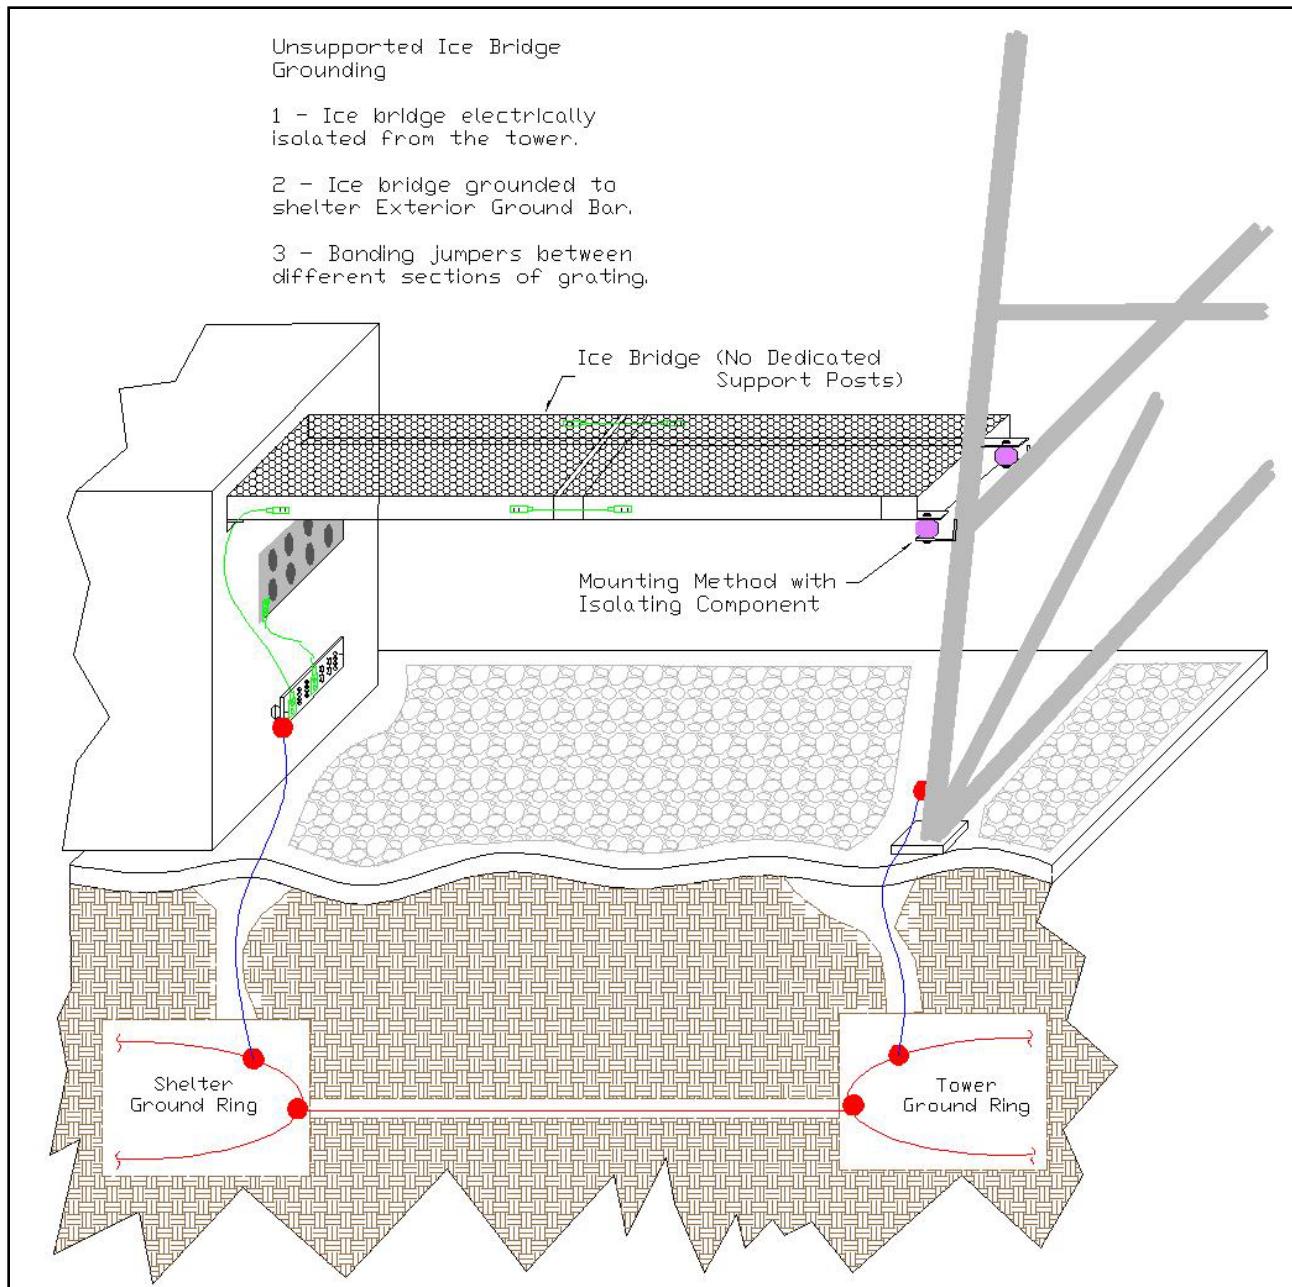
Ice Bridge/Cable Tray Grounding Detail
